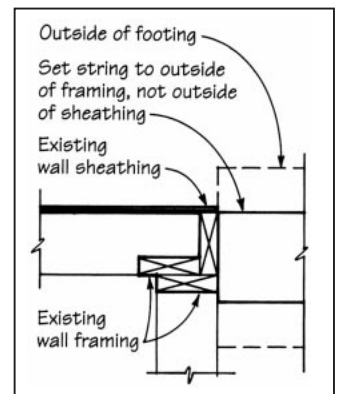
Strings set on batter boards mark the building lines, defined as the outside edge of the foundation and frame wall.
